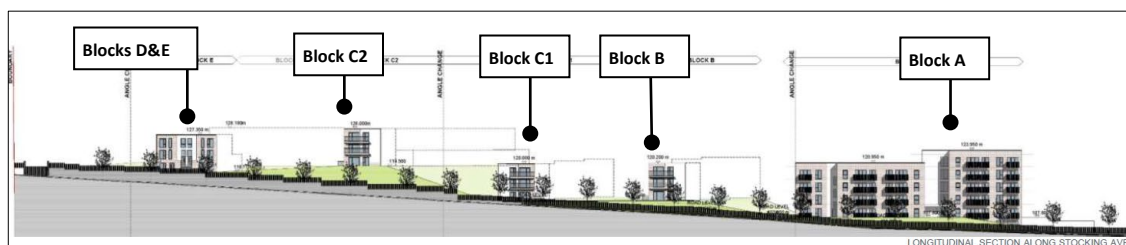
Site Section: Proposed Development May 2021 (Source: RAU.)
